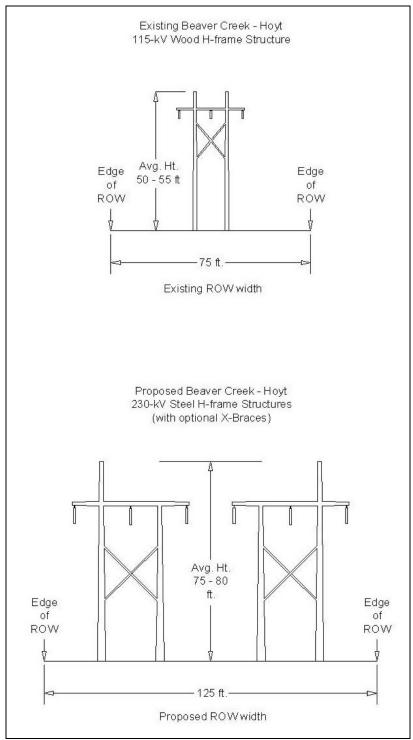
Comparison of Existing and Proposed H frame Structures and ROWs
